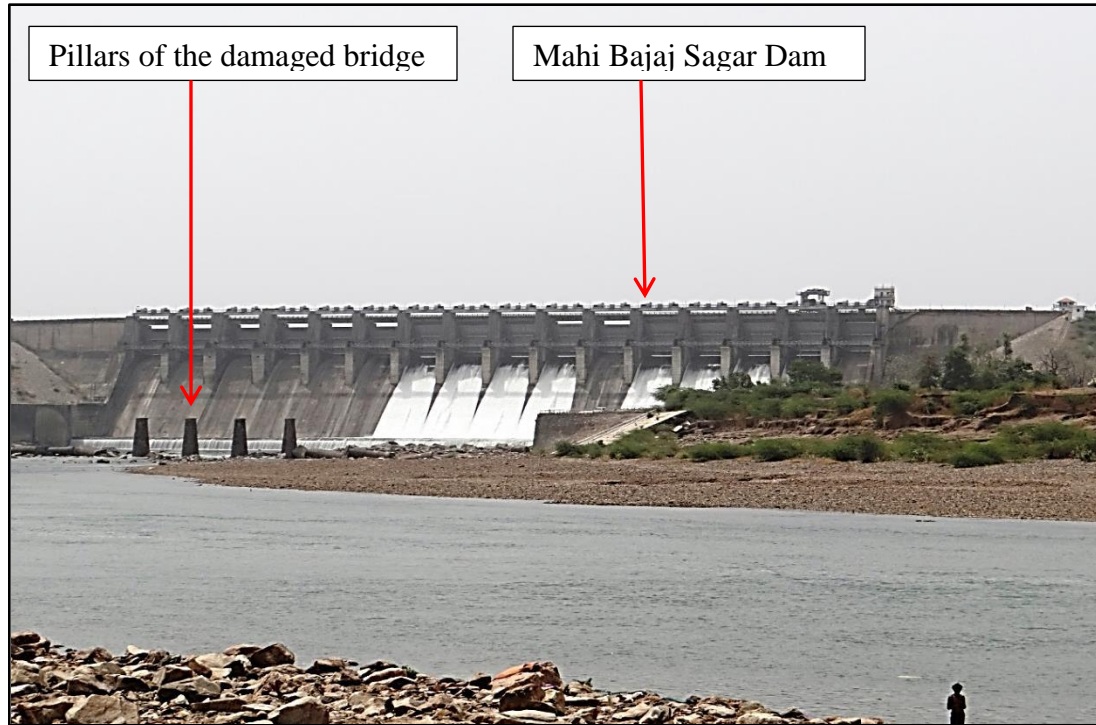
A view of damaged bridge due to 1991 flood downstream of the Mahi Bajaj Sagar Dam (Banswara, Rajasthan)
